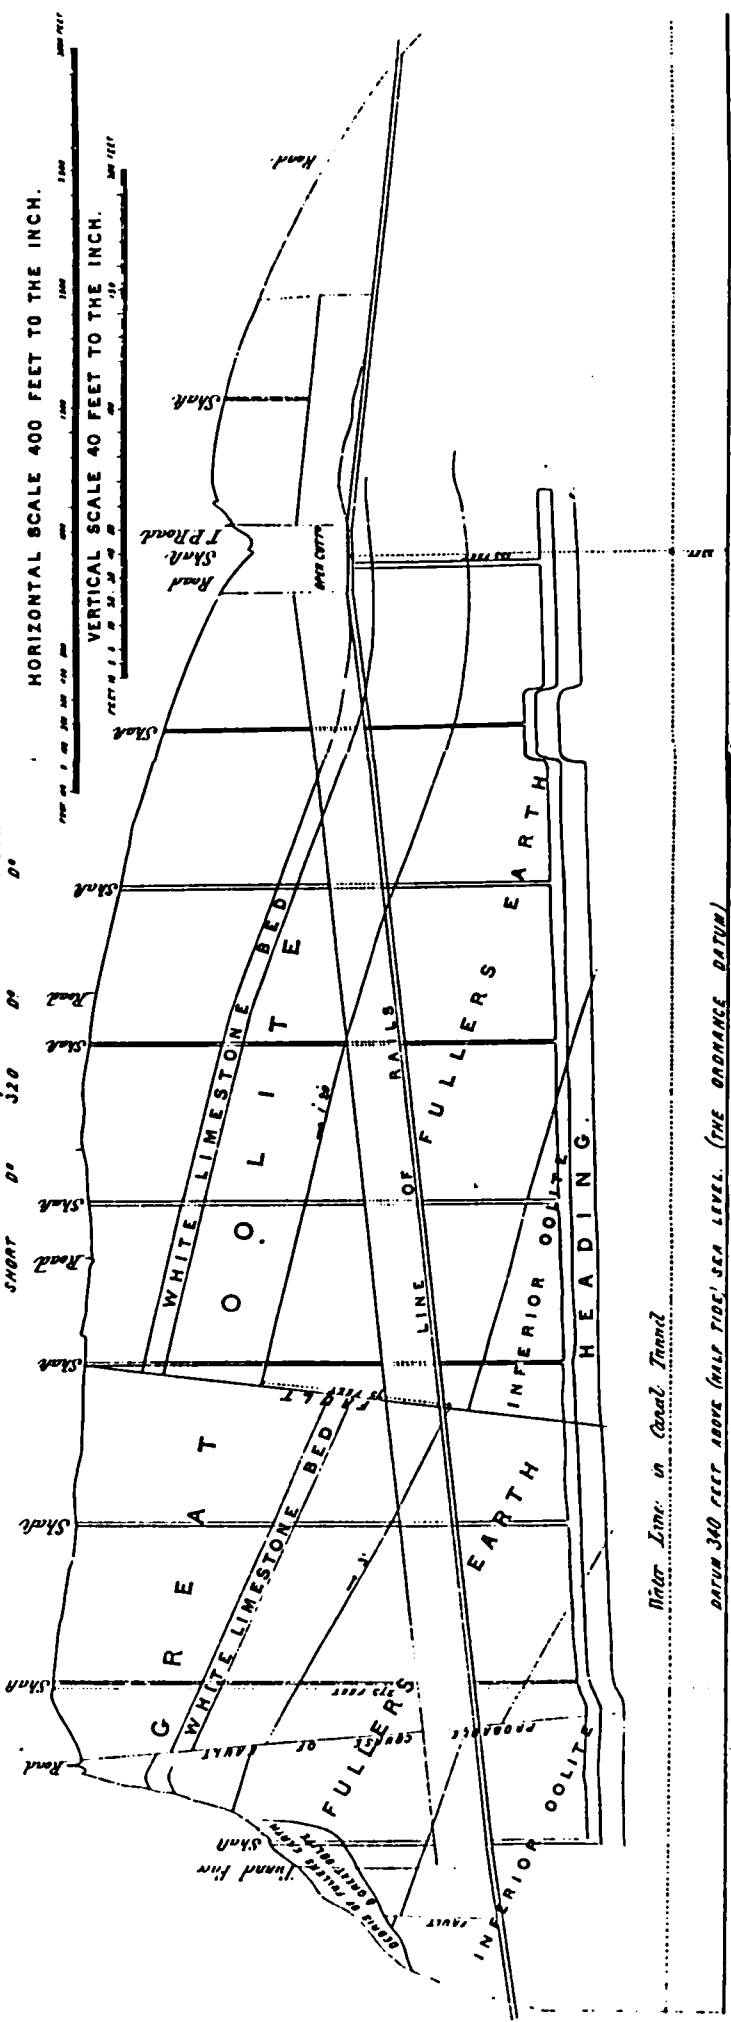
Section of tunnel and abandoned heading, John Taunton 1870.
